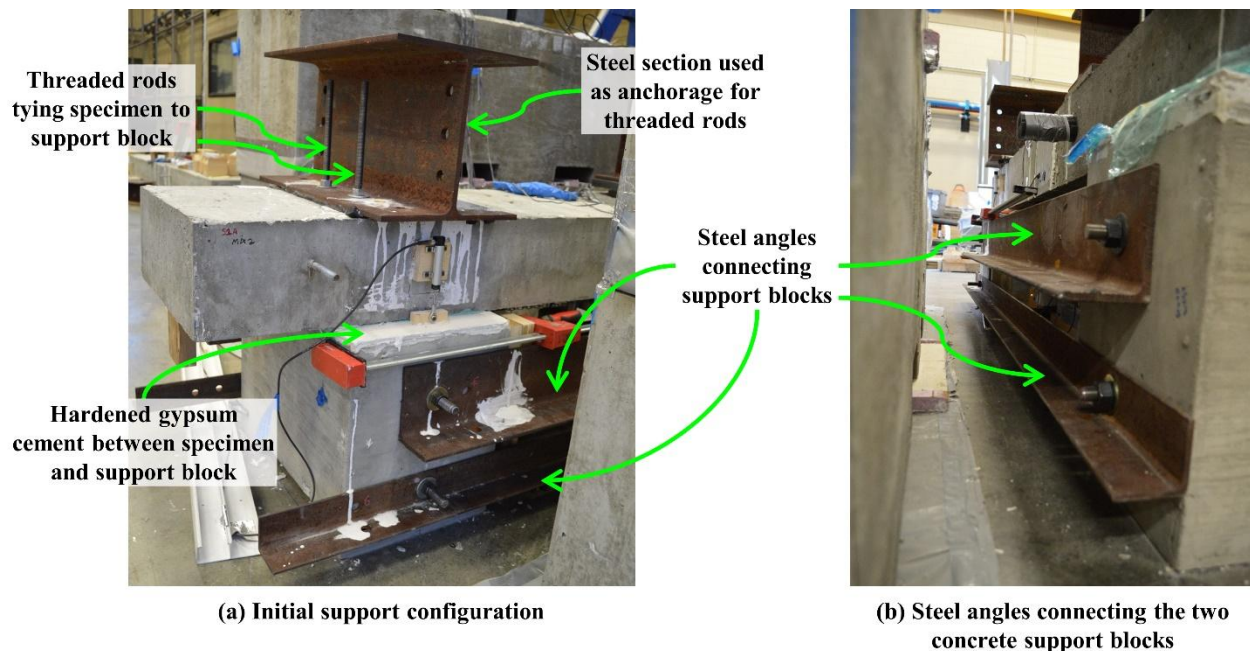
Initial boundary condition configuration used for specimen Slab-SL-UH1
